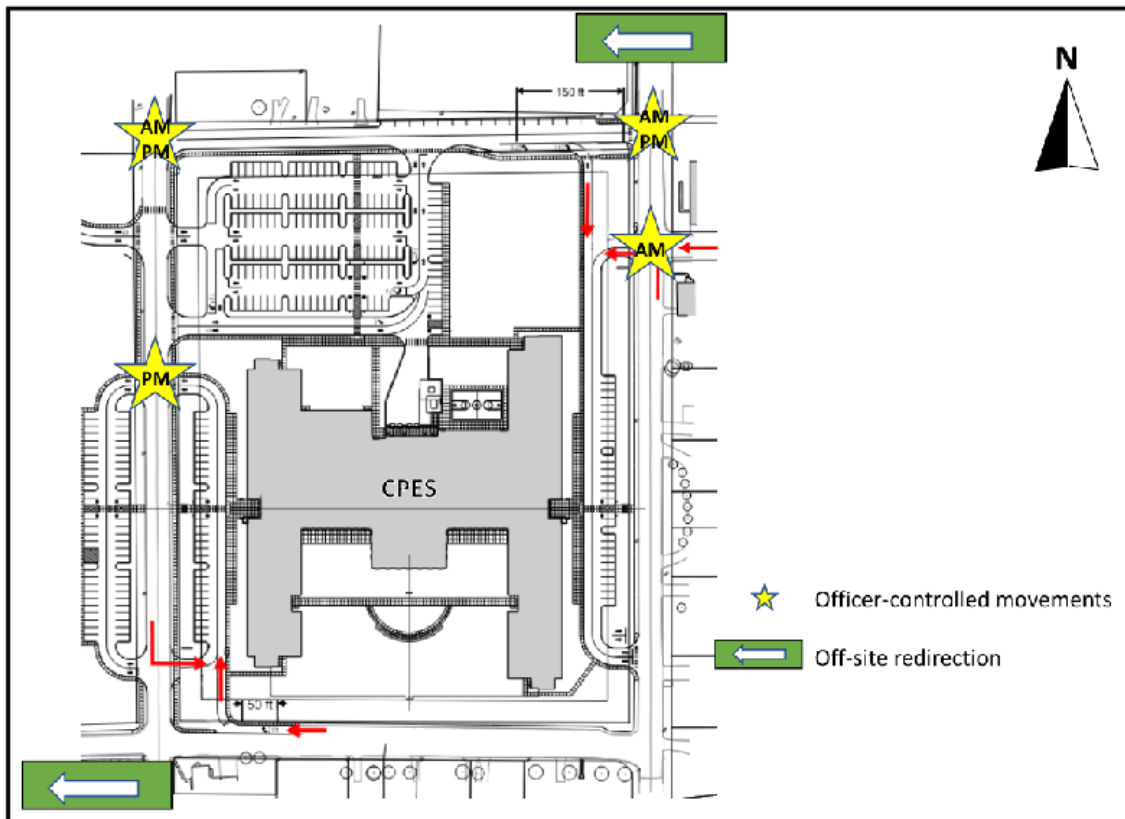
Recommendations for traffic operations and movement at the new schools complex.
